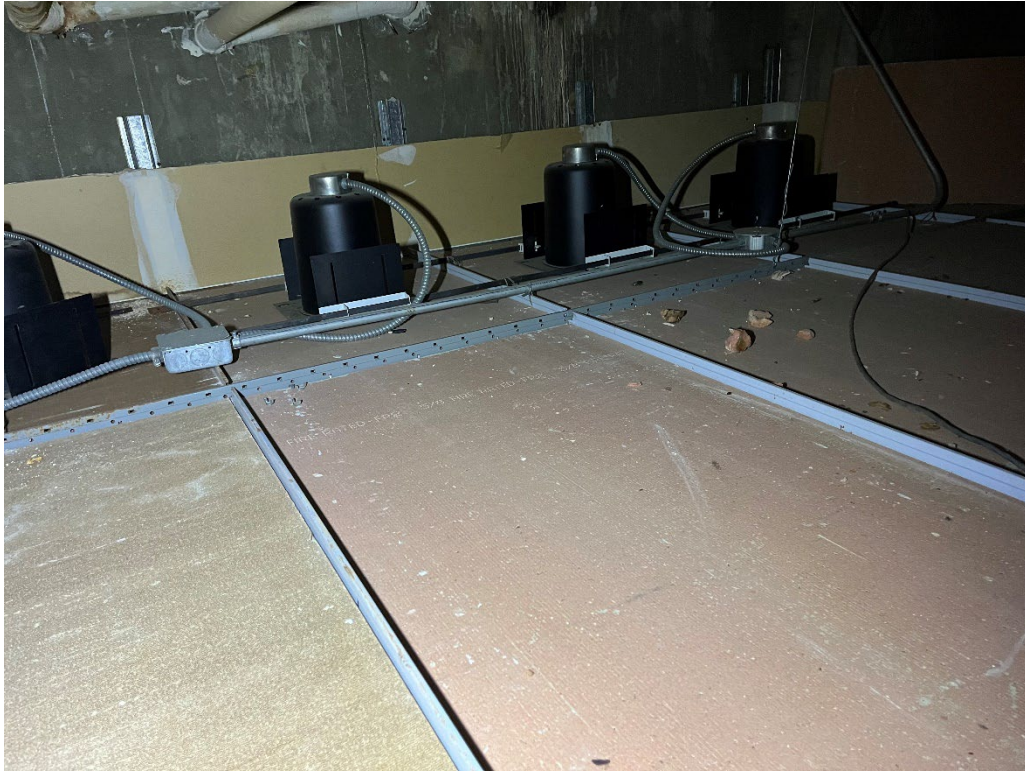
View of asbestos ceiling tiles in Level 1 – Vault D.
